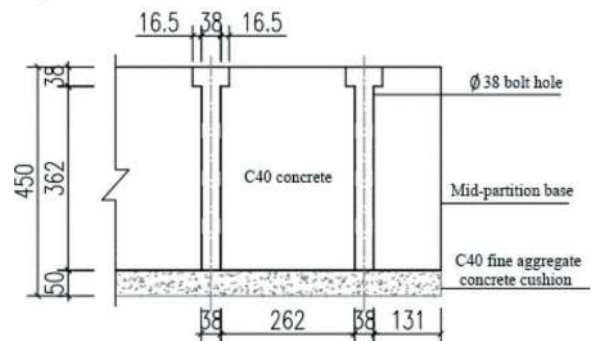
Connection between substructure and Mid-partition (Unit: mm).
